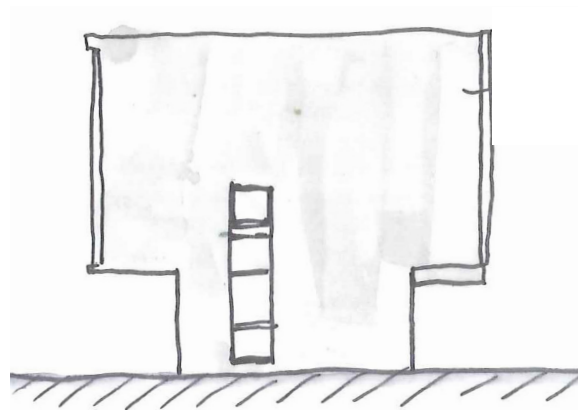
Original, concrete, west facade of the terraced houses in Vrieheide (own ill.)
